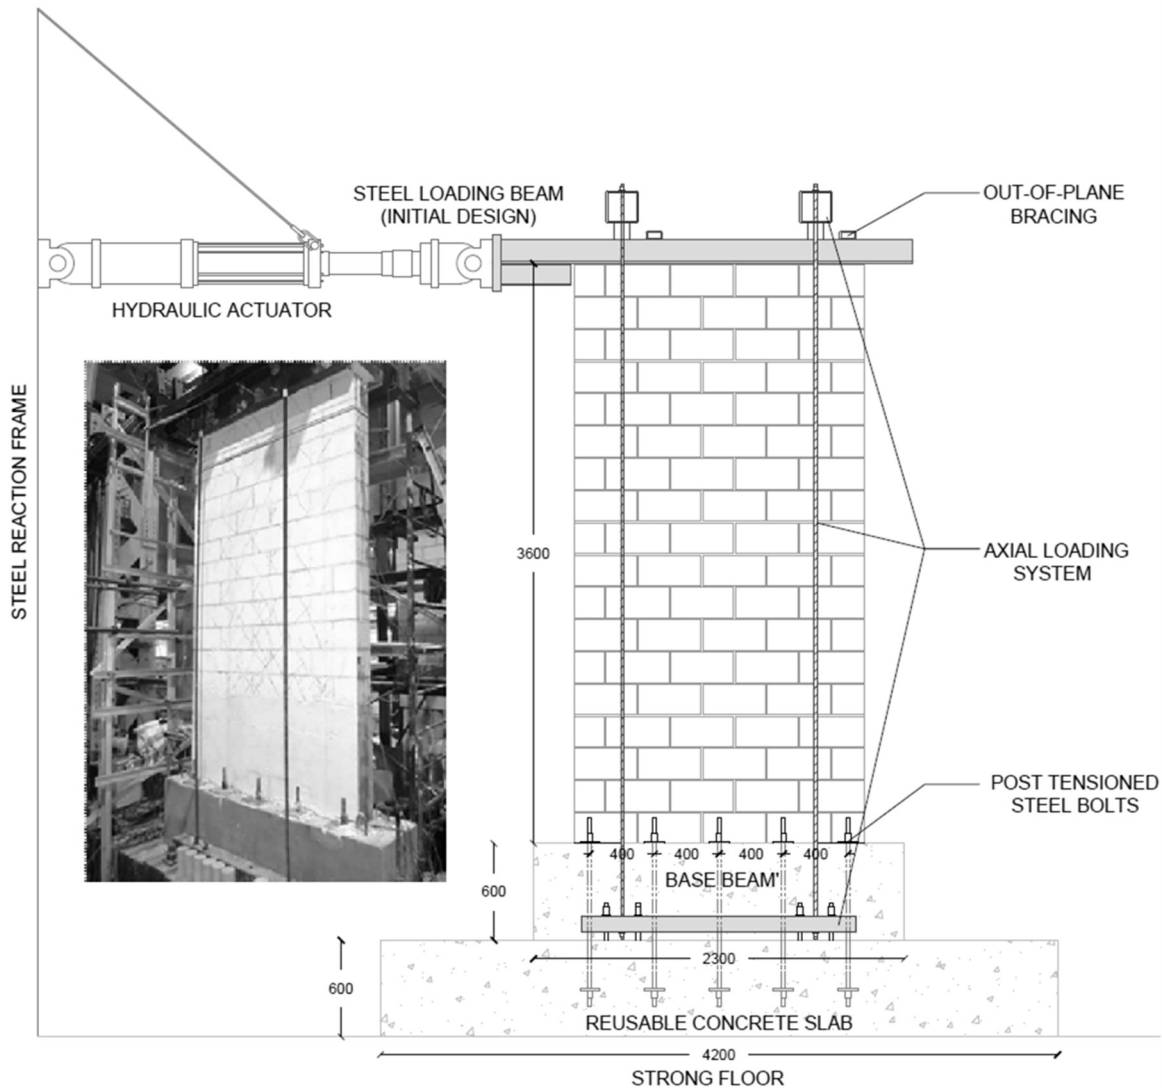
Wall Test Setup: Lateral Loading System (dimensions in mm)
